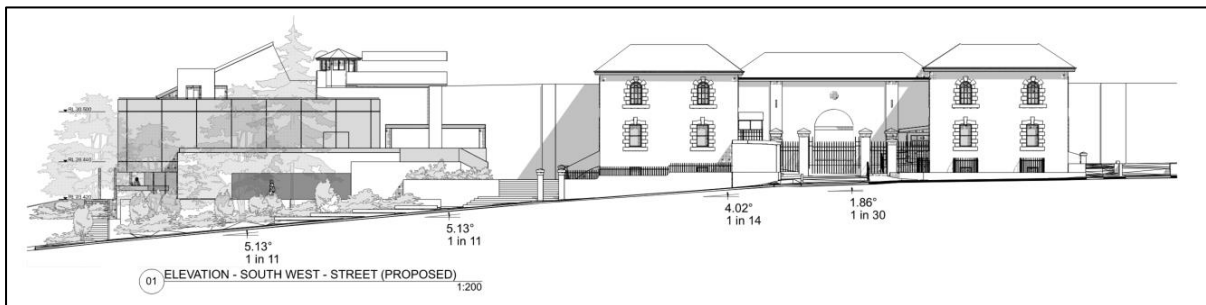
Building 14 Southwest Elevation. Source: Maitland City Council dated 20/06/2023
